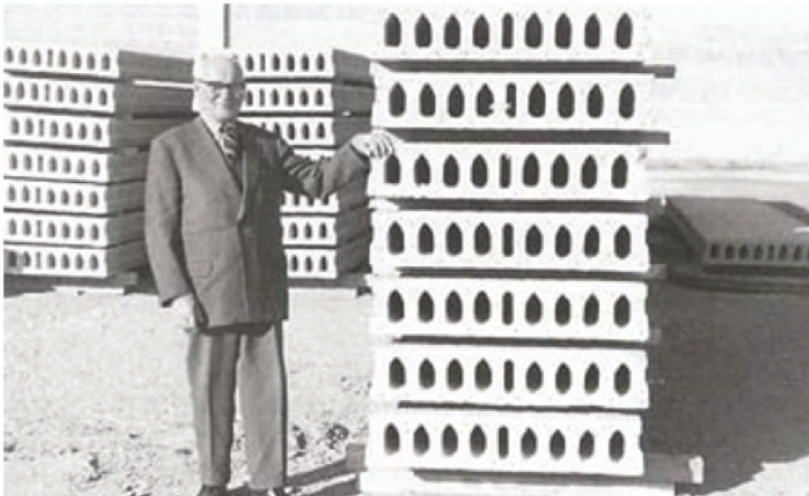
Otto Kuen and Spancrete Prestressed Hollowcore Slabs - courtesy of Spancrete.
